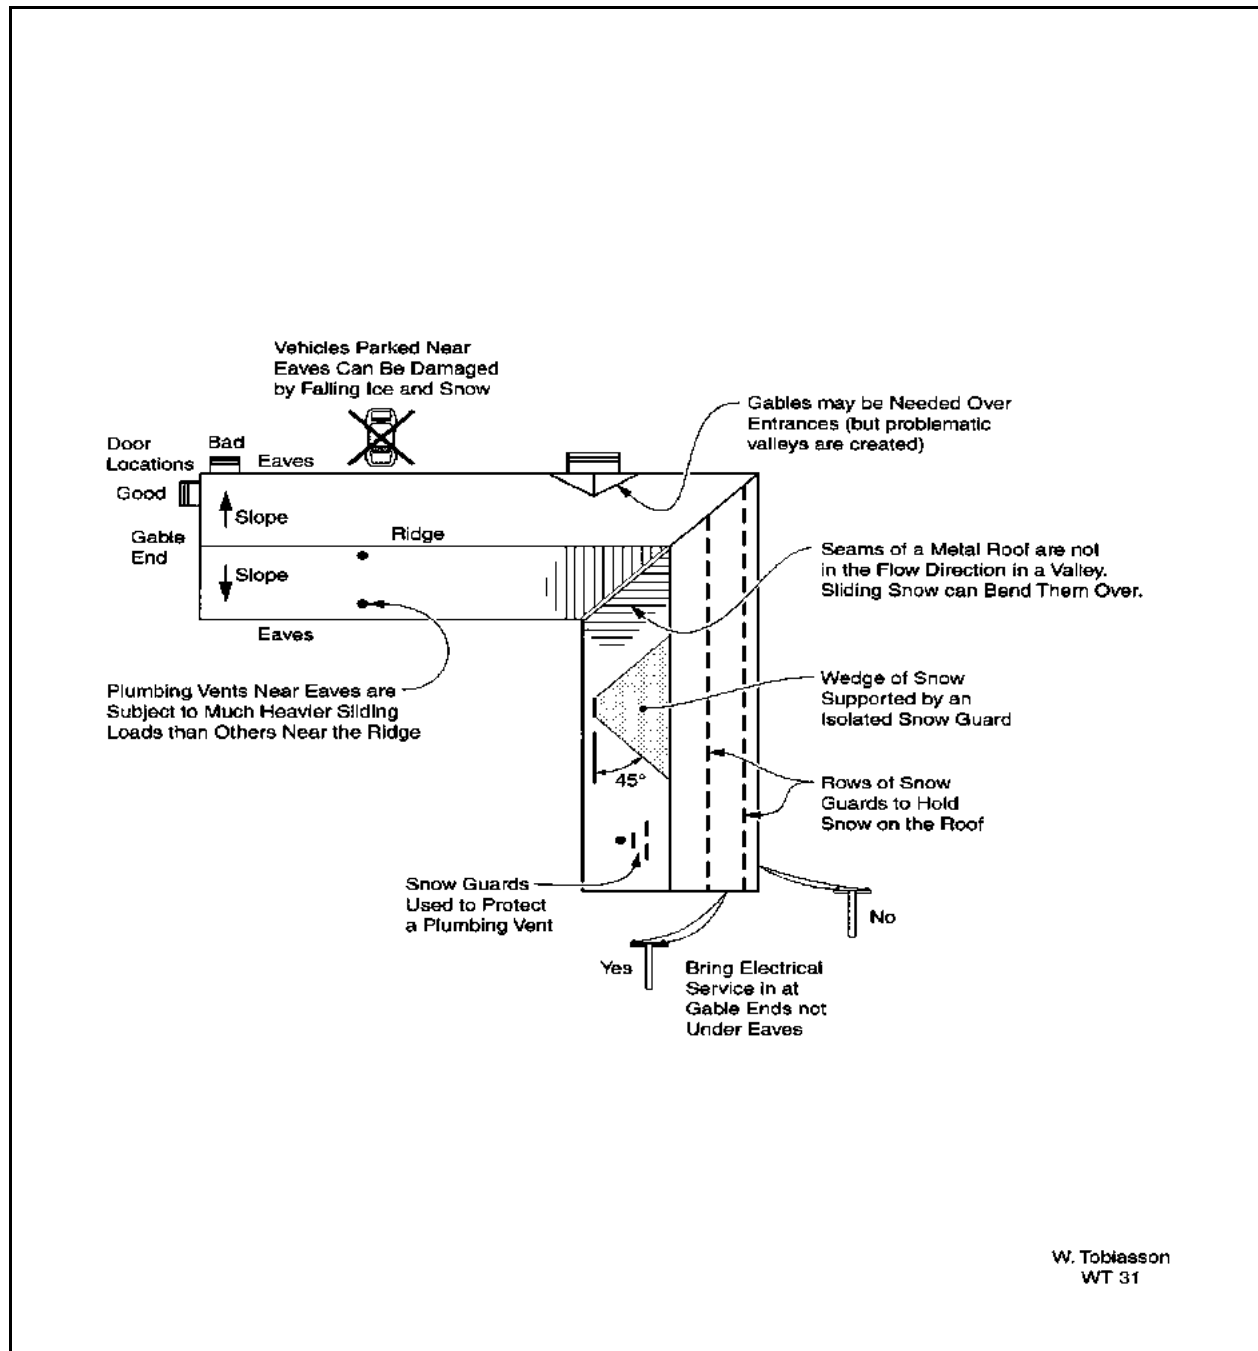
Plan view of a gable-roofed building showing some sliding snow issues.
